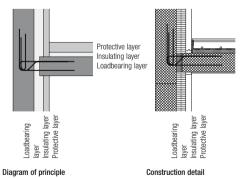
Case study: floor support separated, continuous insulating layer This type of construction is only possible in reinforced concrete because the chromium steel anchors must be integrated into the wall and floor reinforcement. Compression-resistant insulation must be incorporated between the face of a wall and the edge of the floor. Such insulation is often included with the respective anchor system (e.g. Schöck-Isokorb)
